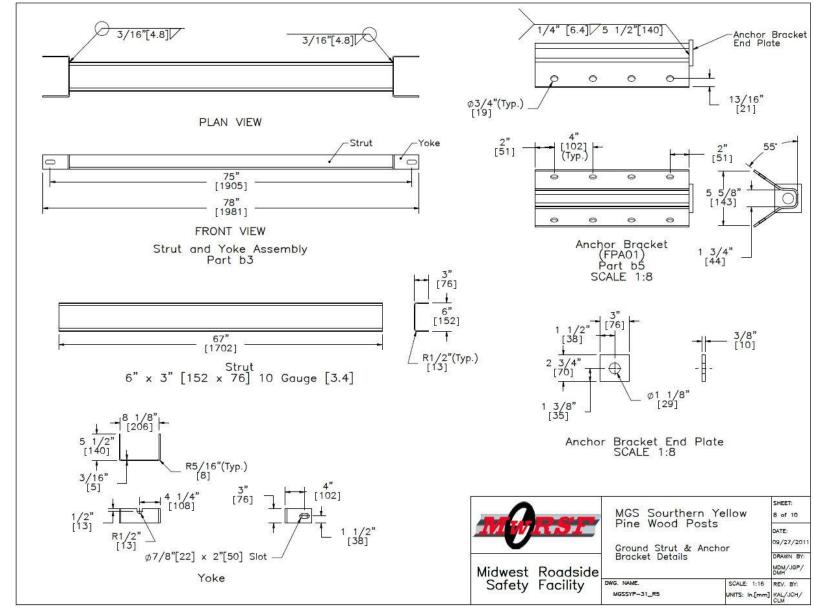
Ground Strut and Anchor Bracket Details, Test No. MGSSYP-1
